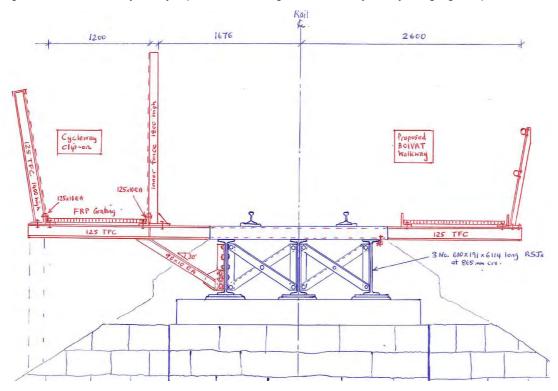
Typical section through cycleway clip on and Rail Bridge 11 BOIVR.
